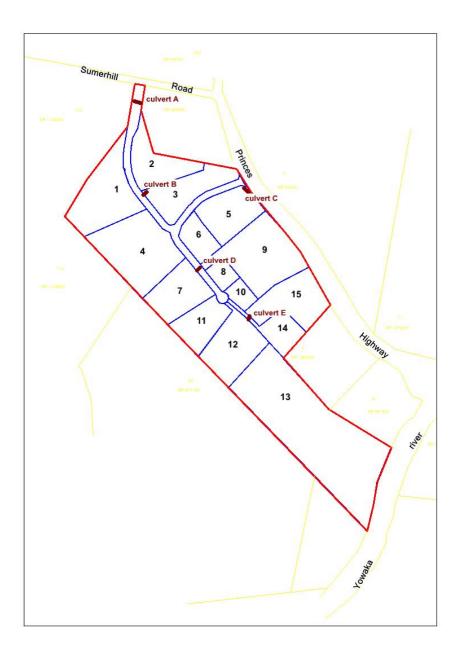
Proposed Lots and location of five drainage outfall culverts A, B, C, D and E (Barry 2022)
